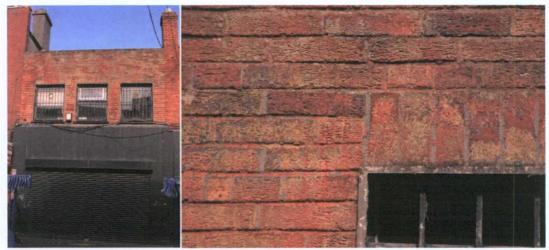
General view of 19 Moore Street with a detail of the painted brick at first floor level.
